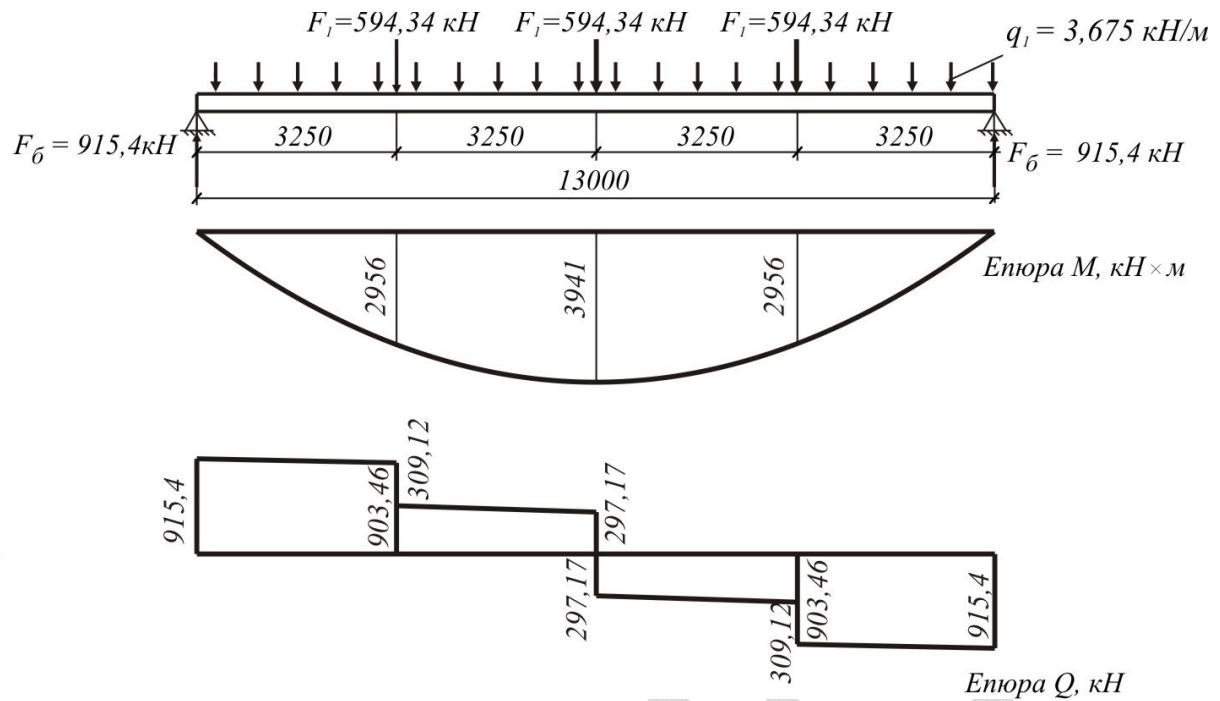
Structural scheme and plots of forces acting in the cross sections of the main beam
